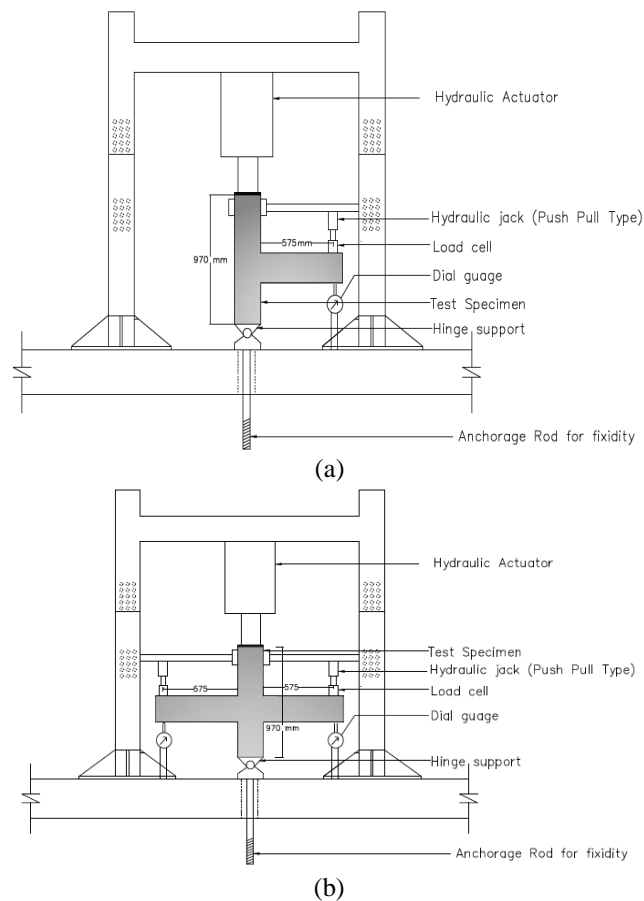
Experimental test setup for beam-column joint specimen, (a) exterior joint (b) Interior joint.
